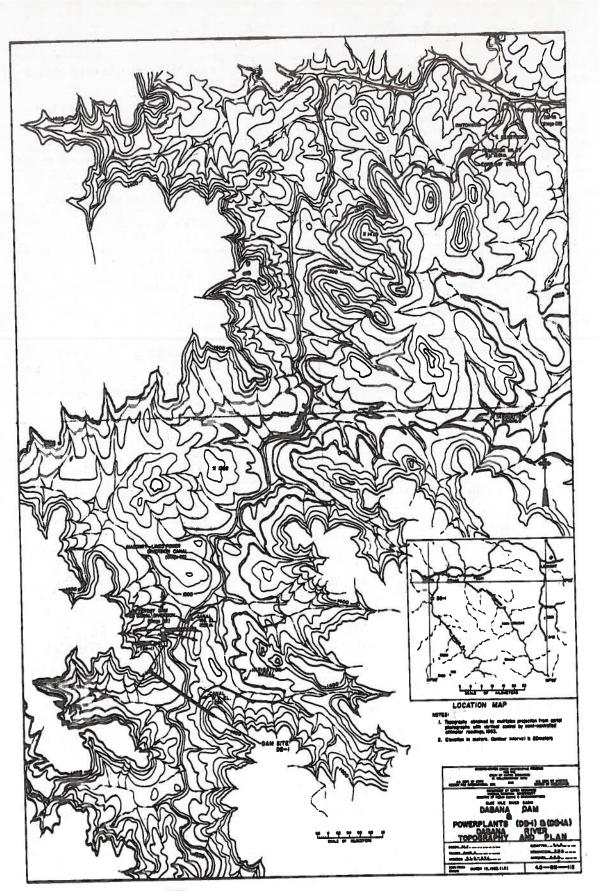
Dabana Dam and Powerplants DB-1 and DB-1A, Topography and Plan
